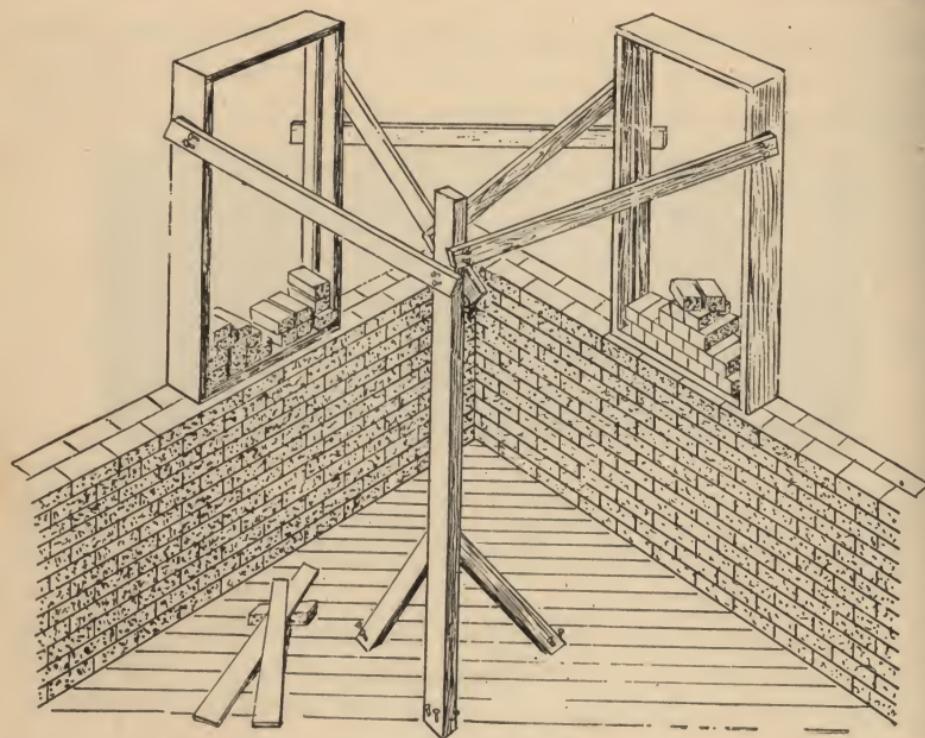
,293.—Method of bracing window frames to allow room for scaffold beneath braces. *In bracing*, place an upright at about the center of a small house, braced in two directions near the brace with short pieces of plank. All the window frames on the story are then braced to the upright with braces placed horizontally, near the top of the frame, sloping braces being entirely avoided. This provides clear working space under the braces and scaffolding can be moved around at will. The carpenter should pile a few brick on the sill to assist in holding the frame steady. If he fail to do this, the bricklayer should place them himself before starting to brick the window in.
